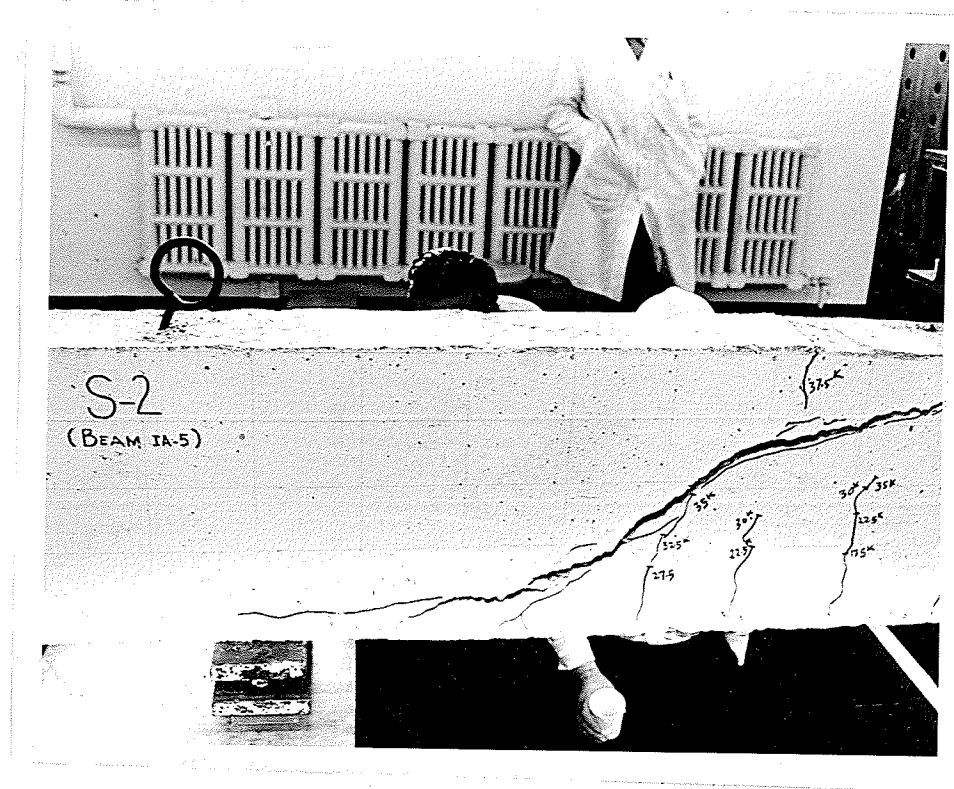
FAILURE OF BEAM IA-5 ON END S-2
